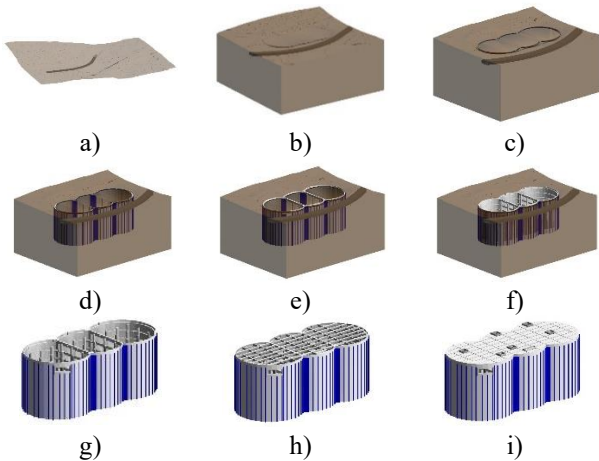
Phases for the execution of the structure: a) existing; b) excavation; c) guide wall; d) panels and jet grouting; e) first beam; f) rings and struts; g) structural columns; h) cover beams; i) roof slabs.
